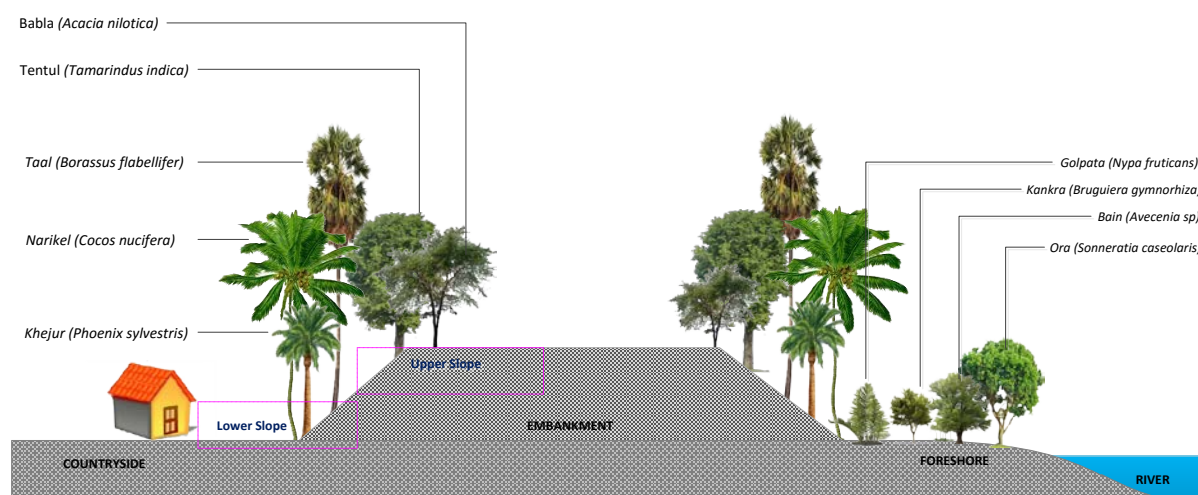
Typical cross section of Embankment slope and Foreshore Afforestation
